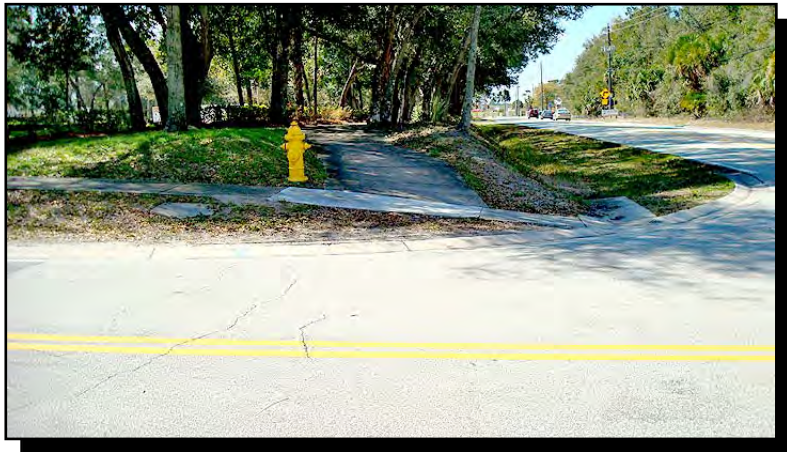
No Level Landing or Ramp at the Intersection of Taylor Road and Boggs Ford Road
